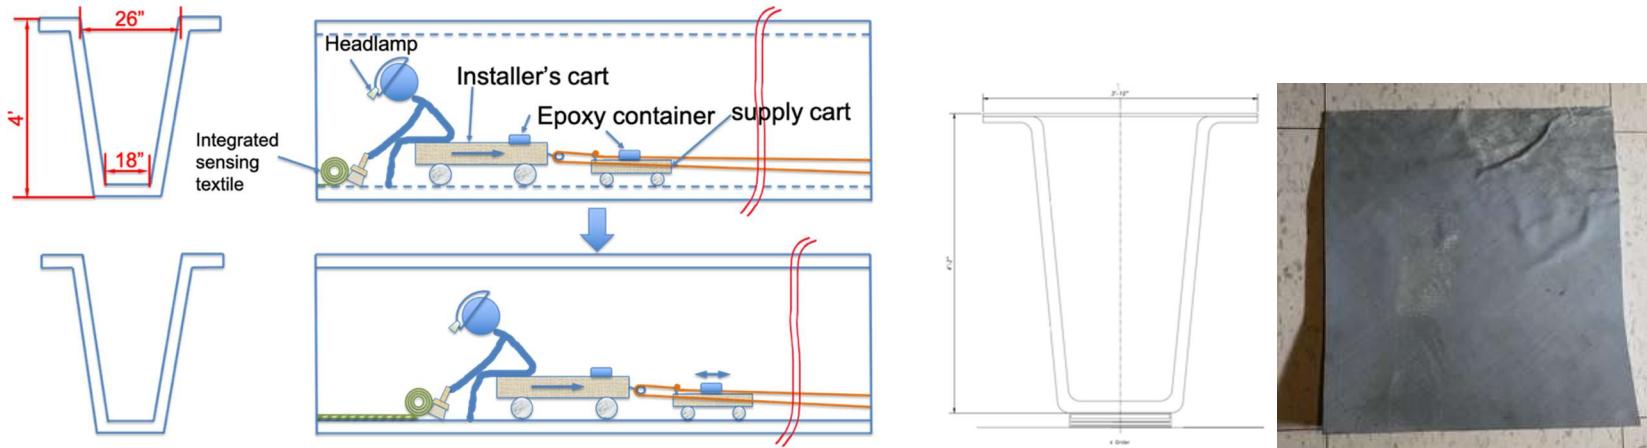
(a) Installation schematic (b) Detailed cross section of a composite bridge girder (Source: MaintDOT) and composite sample (by AIT Bridges)
